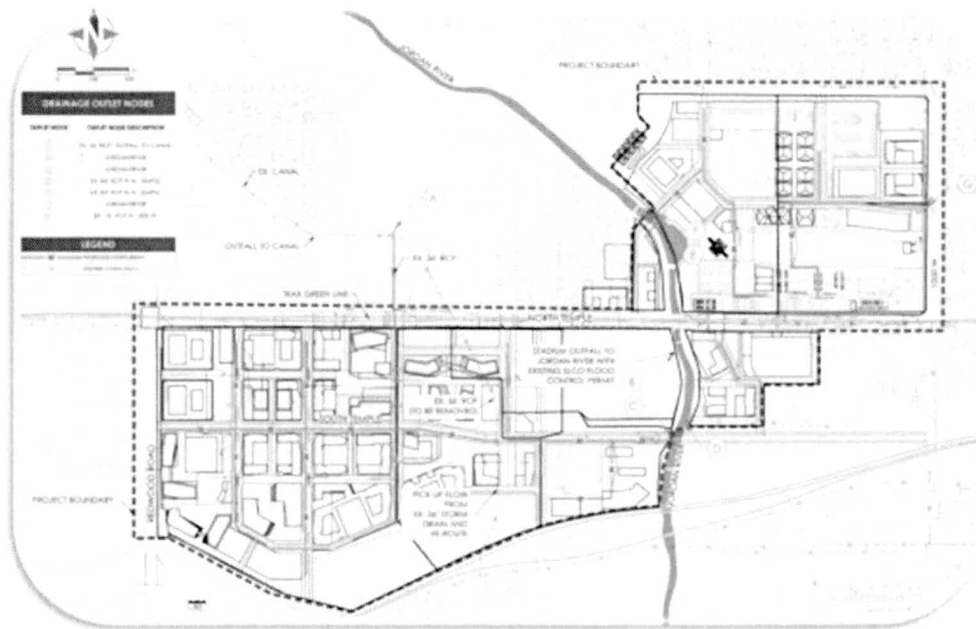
Future Condition Storm Drain Routing and Outfall Locations
